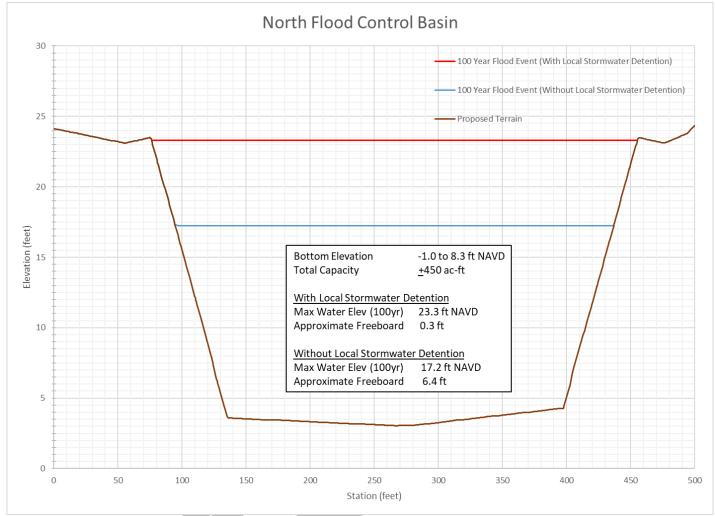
North Flood Control Basin Maximum Water Surface Elevations
